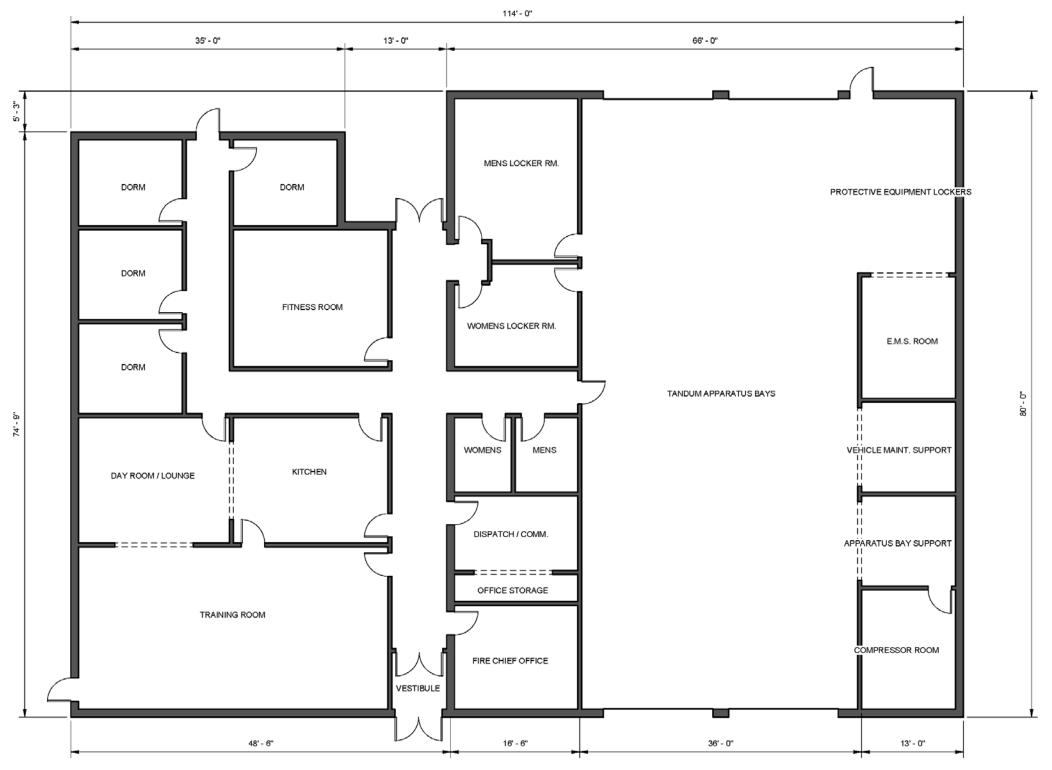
FIRE STATION CONCEPTUAL LAYOUT - 1
